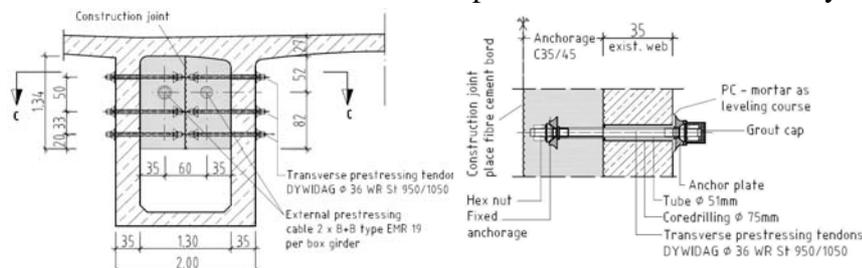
Detail of the anchorage of the external additional prestressing tendons Left: Cross section of a hollow box at end of the cantilever Right: Detail of the anchorage block with transverse prestressing bar St 950/1050)
